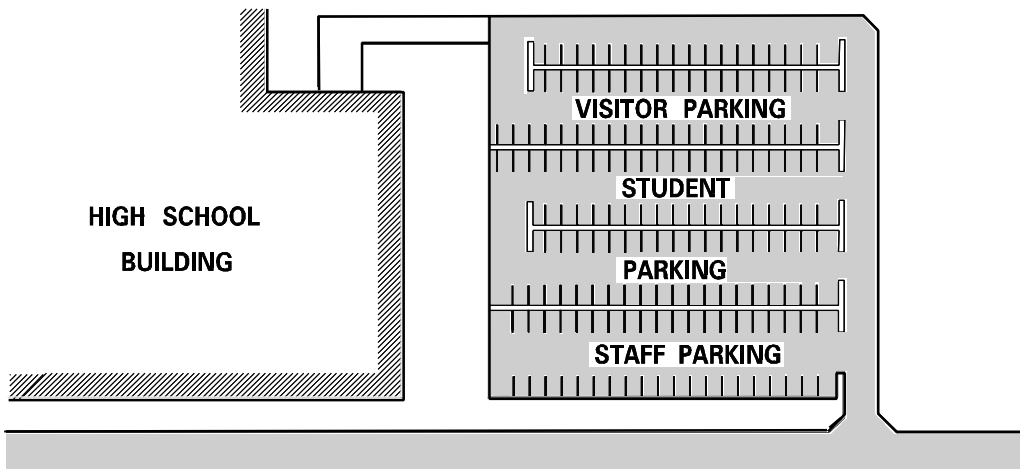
is an example of a high school with a large adjacent parking lot. Presently, visitors, staff and students may park anywhere in this lot. These parking areas should be separated, if possible, by signing and pavement marking. Adding concrete curbs may also be necessary.
